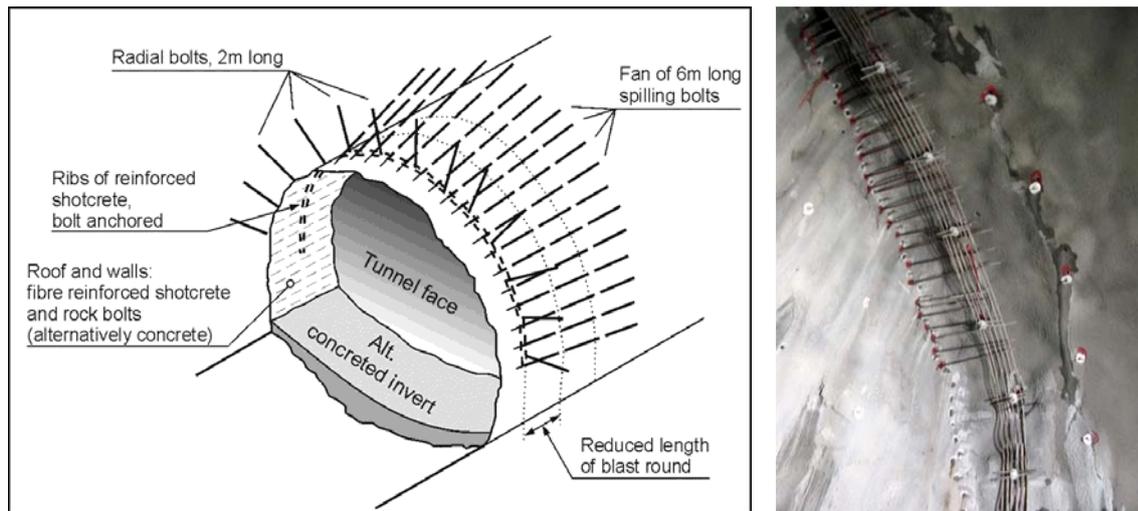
Principle for excavation through poor stability weakness zones based on short round lengths, spiling and reinforced ribs of sprayed concrete (left, based on NFF, 2008), and photo illustrating spiling and shotcrete ribs in tunnel with heavy support also of the face (right).
